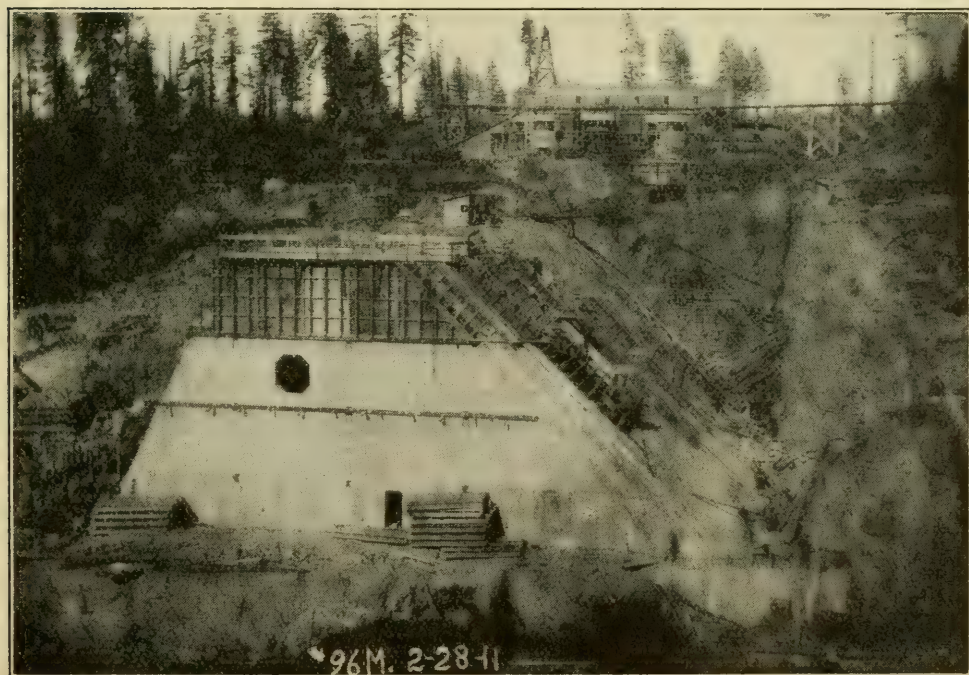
VIEW FROM LEFT BANK. DECK BEING EXTENDED TO INCORPORATE ISLAND IN DAM.
